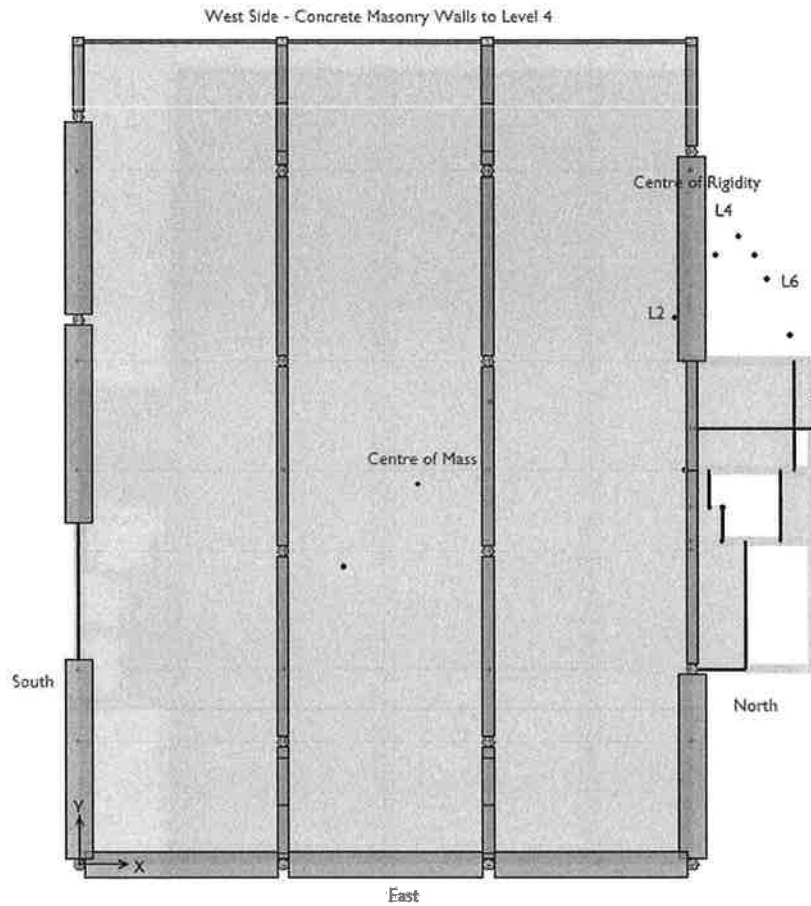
Centre of Mass and Centres of Rigidity for each Floor (North Core, South Wall and Line A masonry infill wall in contact with structure). The centre of rigidity is highly eccentric from the centre of mass in both directions due to the participation of the west side Line A masonry infill wall below Level 4. The earthquake loads act through the building's centre of mass at each floor level, and the building tries to resist the earthquake actions through its centre of rigidity at each level. The offset between the centre of mass and the centre of rigidity is the eccentricity that determines the level of twist or torsion that results. With Line A masonry wall in full contact with the structure the building will have increased torsional response to north-south earthquake ground motions.
